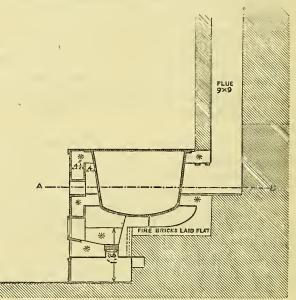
DETAILS showing the Setting of a 25 Gallon Boiler.
